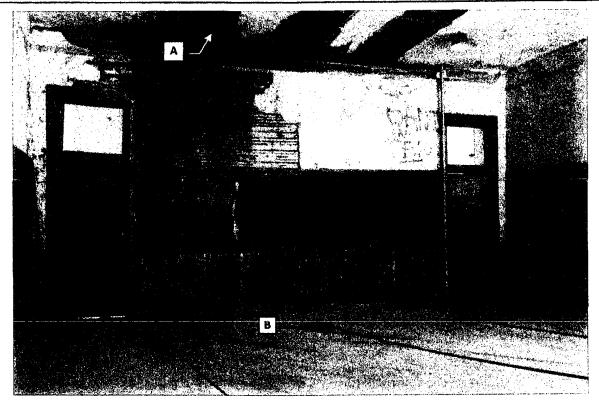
Room 9 view north. (A) Lath and plaster are missing from ceiling, (B) Cable tie-downs
